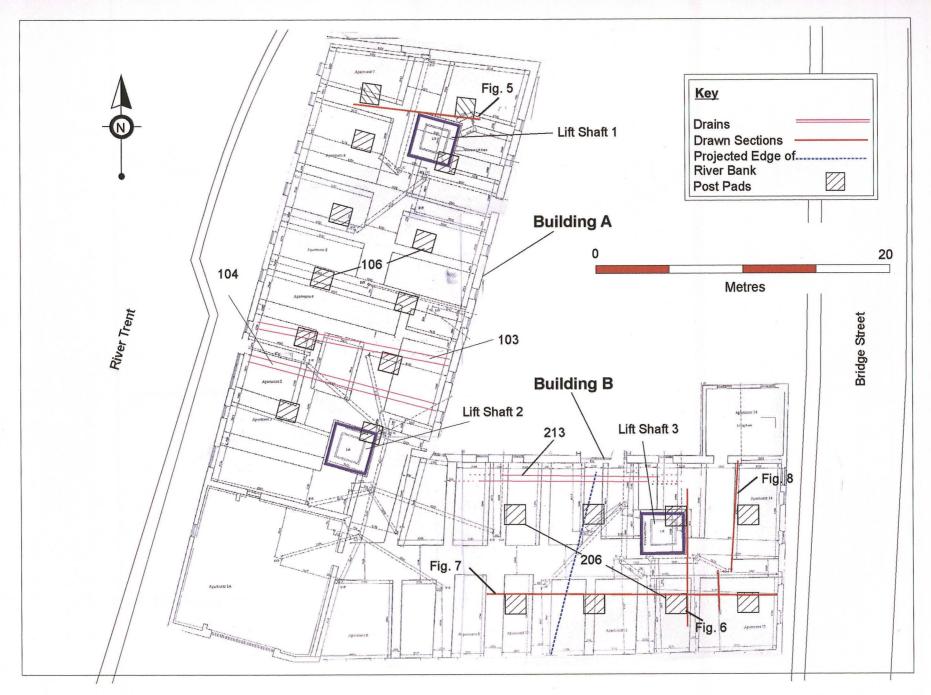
Ground floor plan of Sandars Yard showing the buildings, footings and the results of the watching brief (from a plan supplied by the client)
